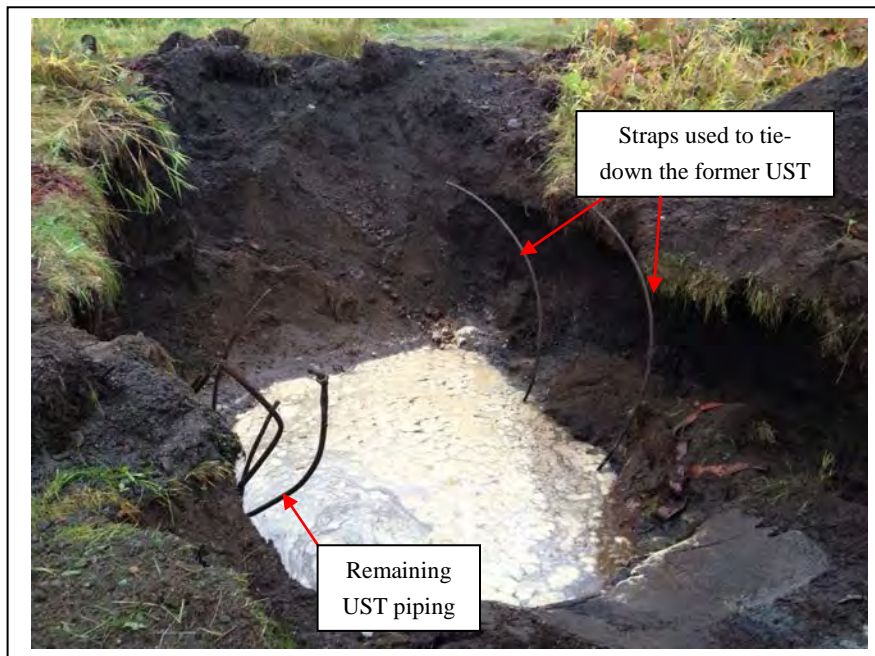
Excavation extent after UST removal; looking east. The excavation filled with water to 3.7 feet below ground surface. (September 16, 2014)
